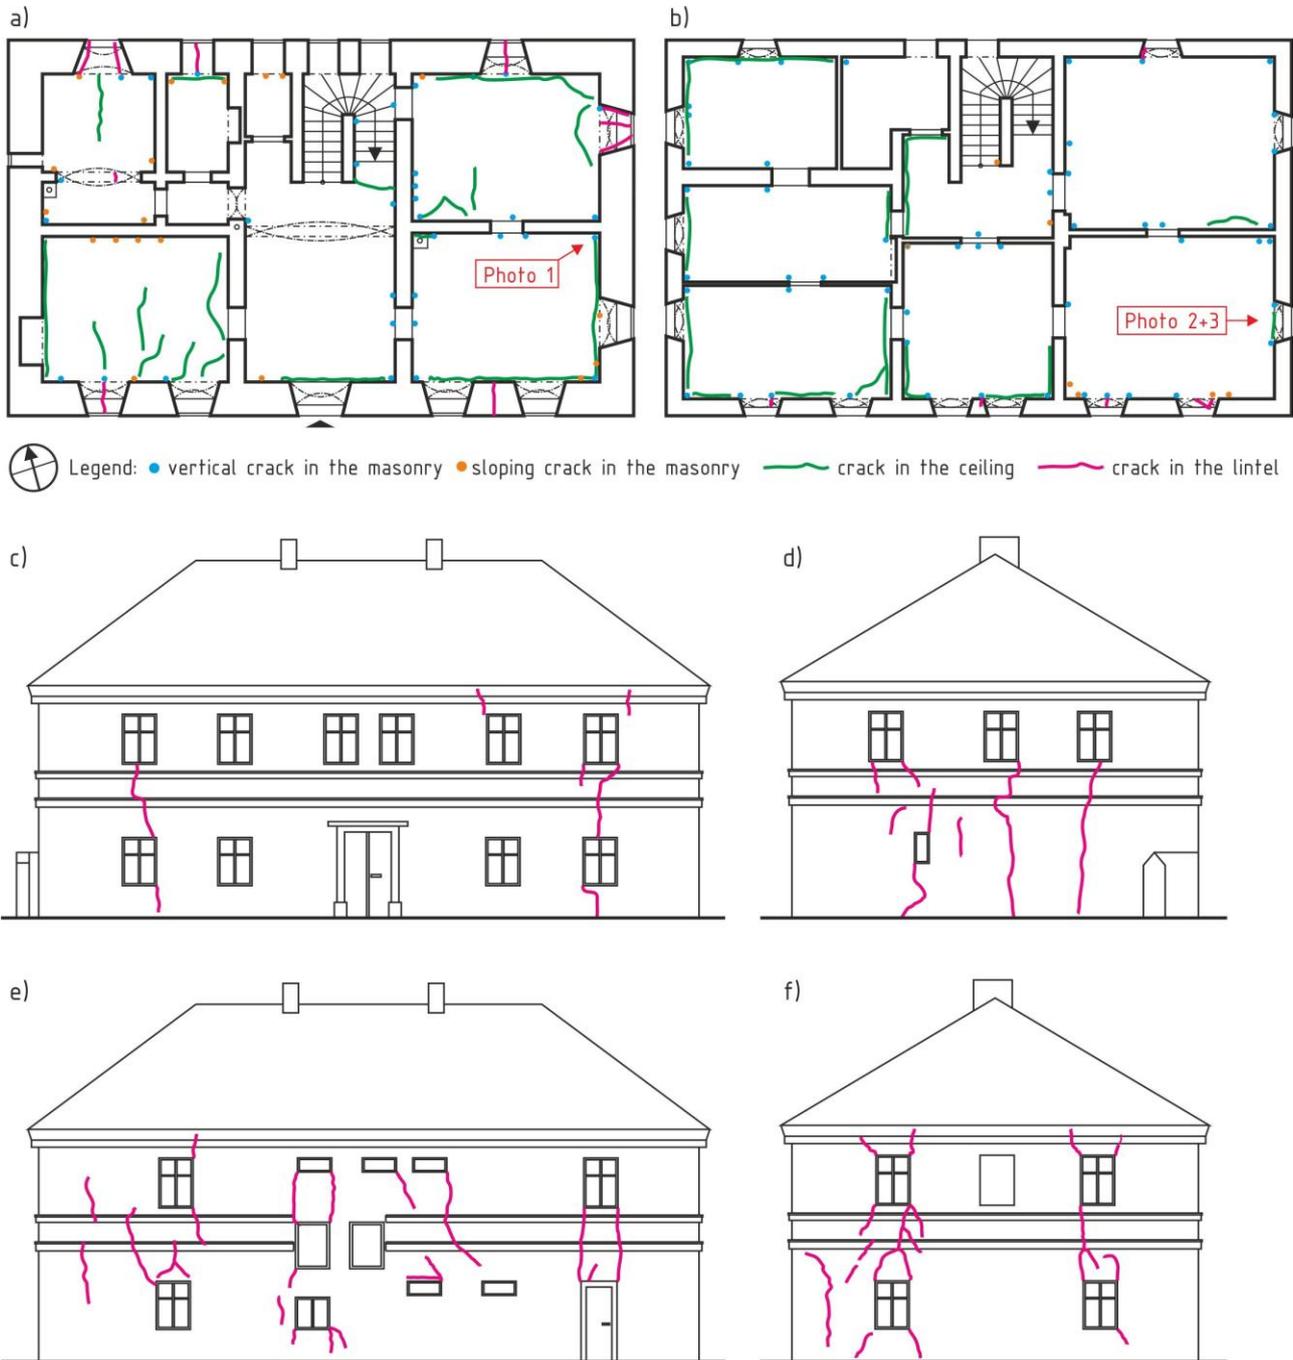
Schematic drawings of the rectory with marked failures and points where photographs were taken – a) plan of 1<sup>st</sup> overground storey, b) plan of 2<sup>nd</sup> overground storey, c) southern elevation, d) western elevation, e) northern elevation, f) eastern elevation
